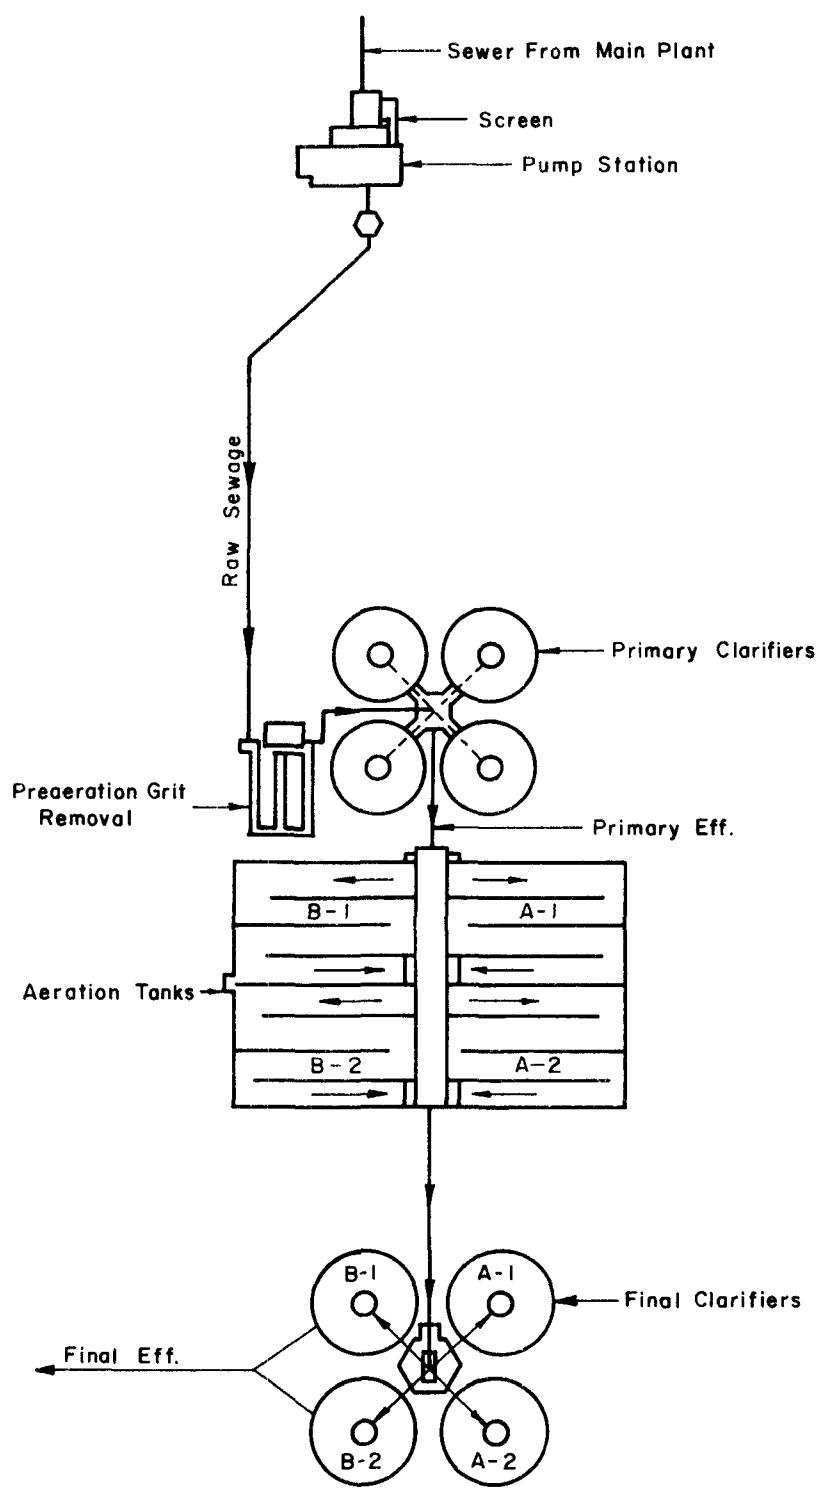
FIGURE I - SOUTHWEST SEWAGE TREATMENT PLANT
